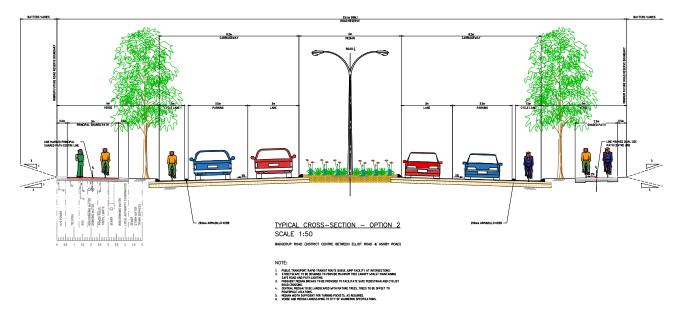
Cross-section Badgerup Road (District Centre between Elliot Road and Ashby Road)
